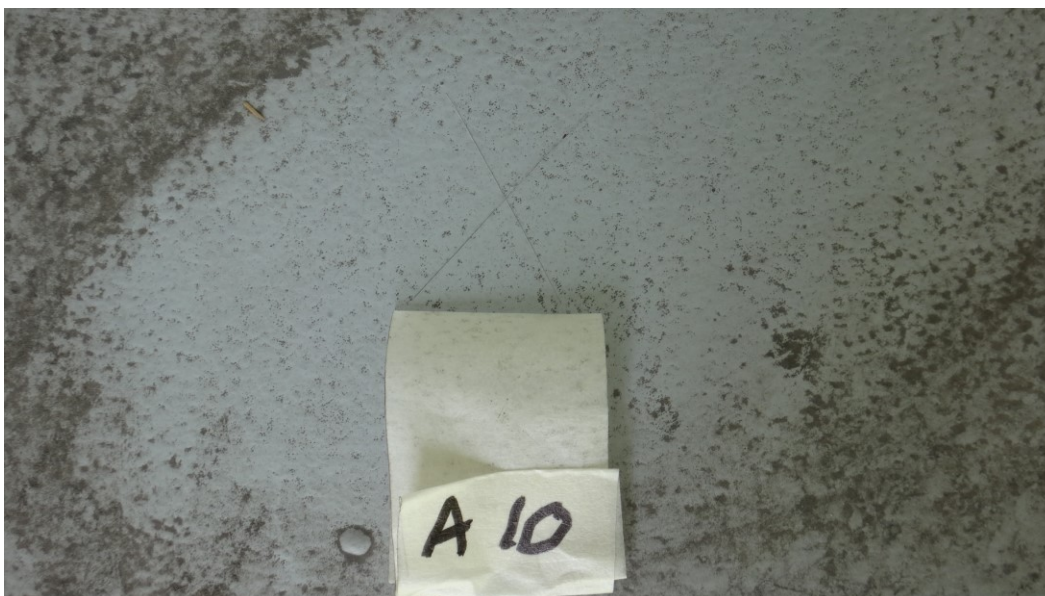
Test Location 2 Adhesion Test A10 - Flange
